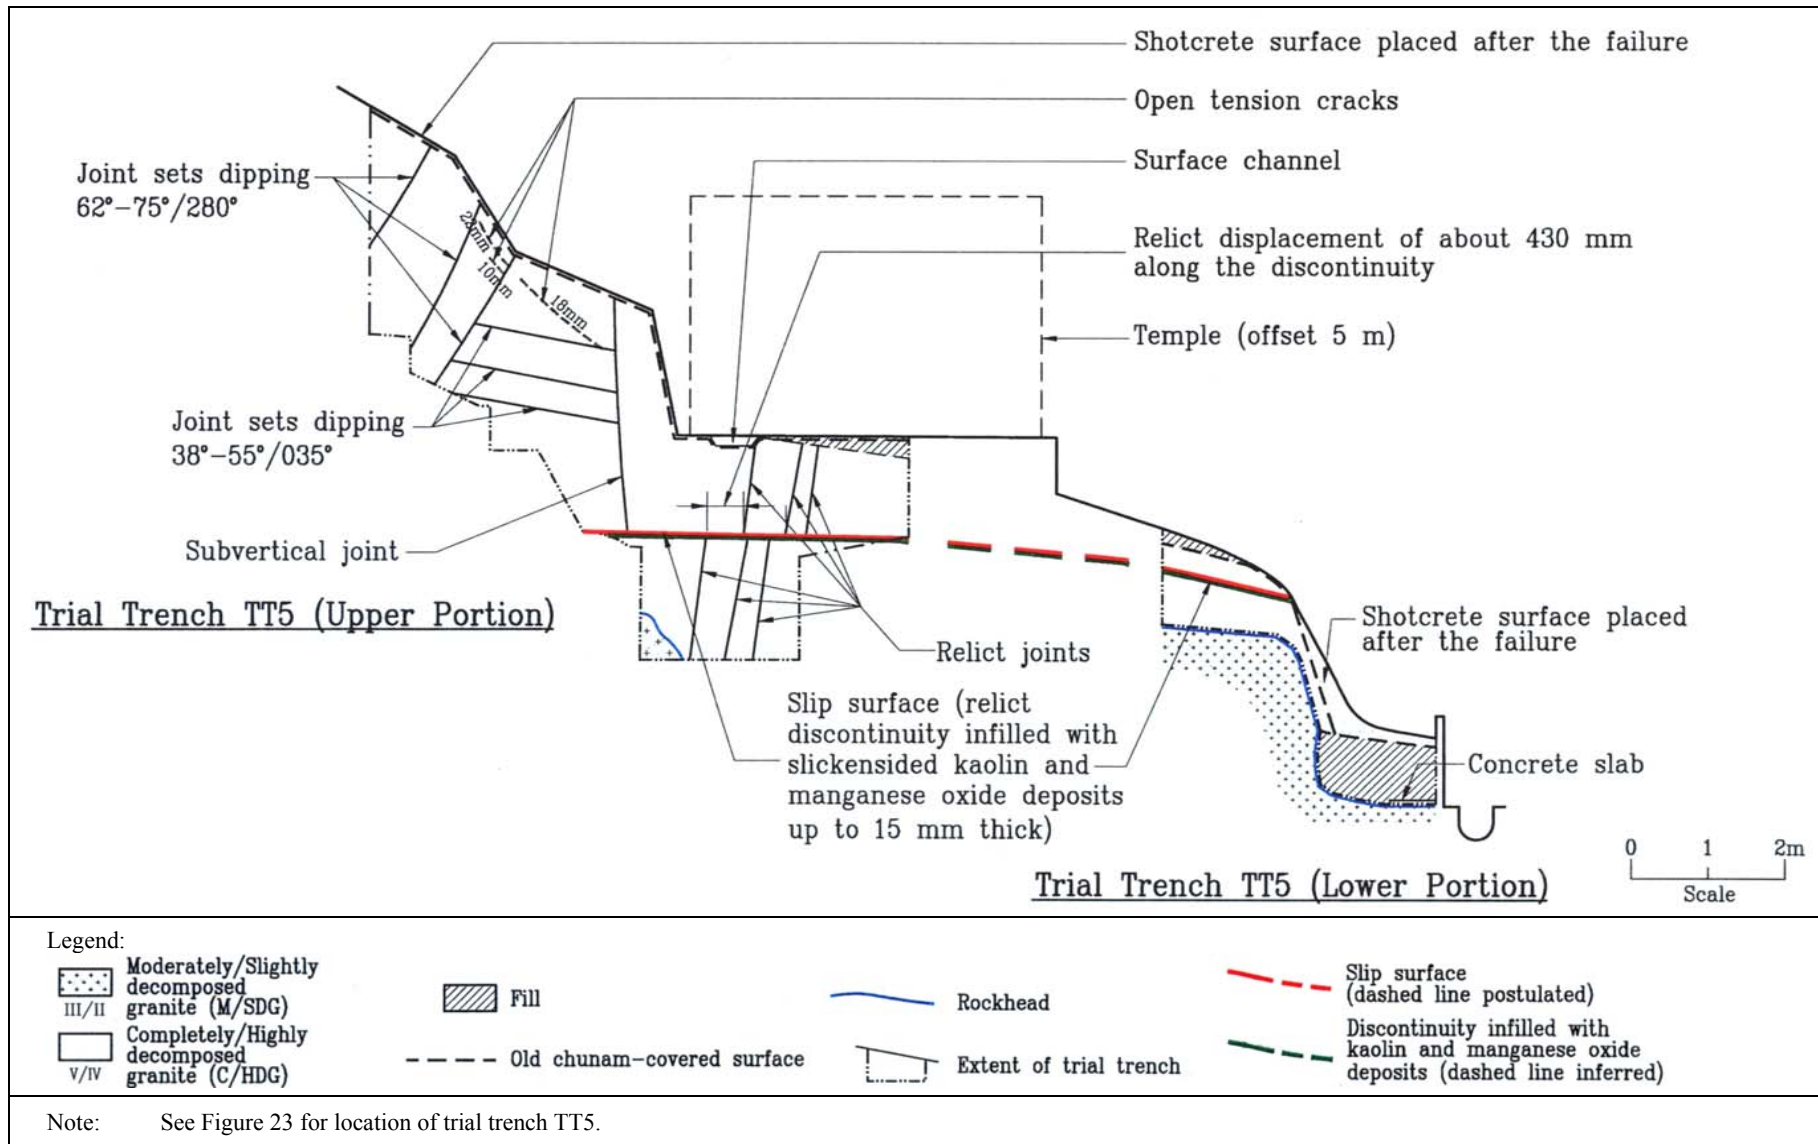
Main Observations in Trial Trenches at Section 2-2
